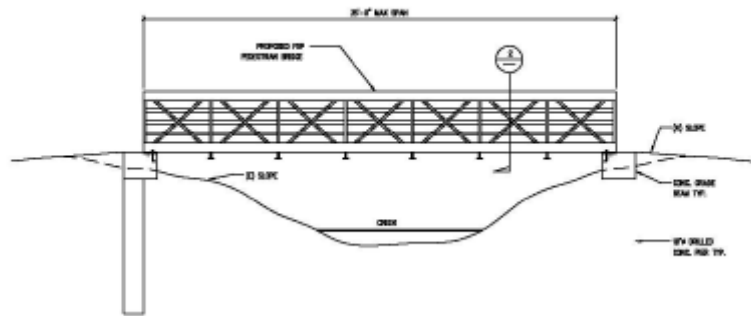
EXAMPLE OF PREFABRICATED BRIDGE STRUCTURE (LANDPEOPLE 2005)
